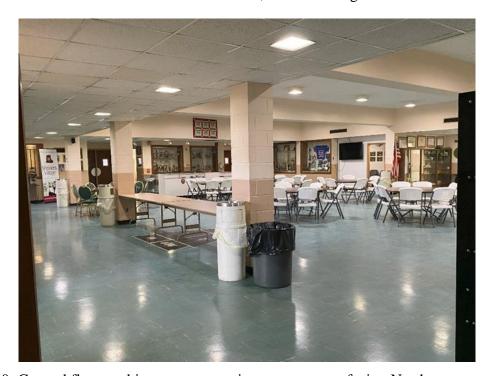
Ground floor multipurpose recreation area, camera facing Northeast.
